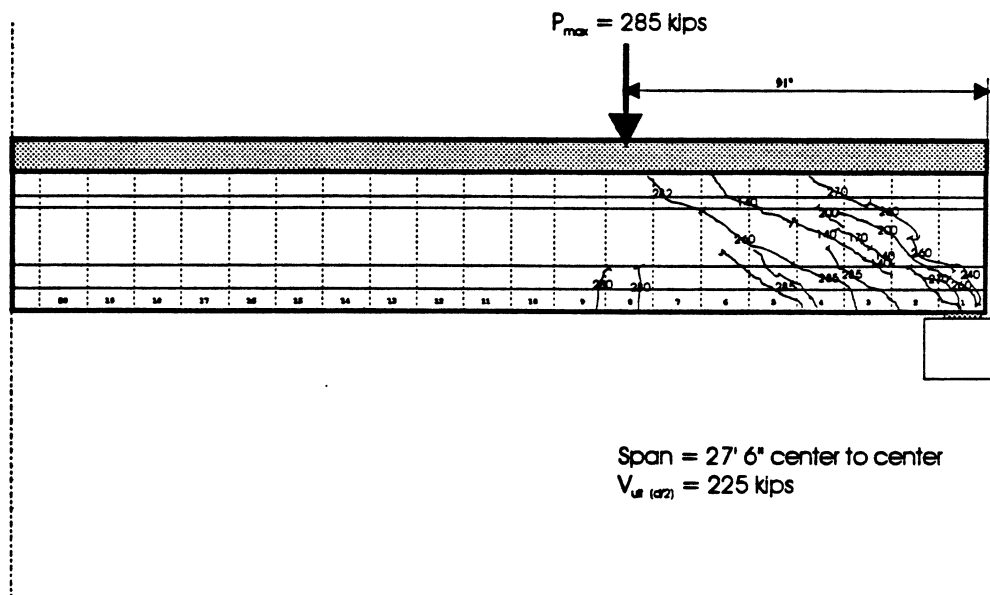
Cracking Pattern for Girder F8S
